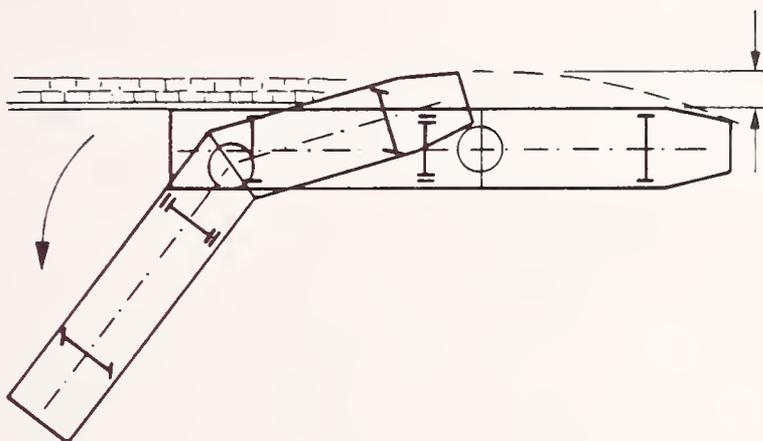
SWING-OUT WITH STEERED REAR AXLE
